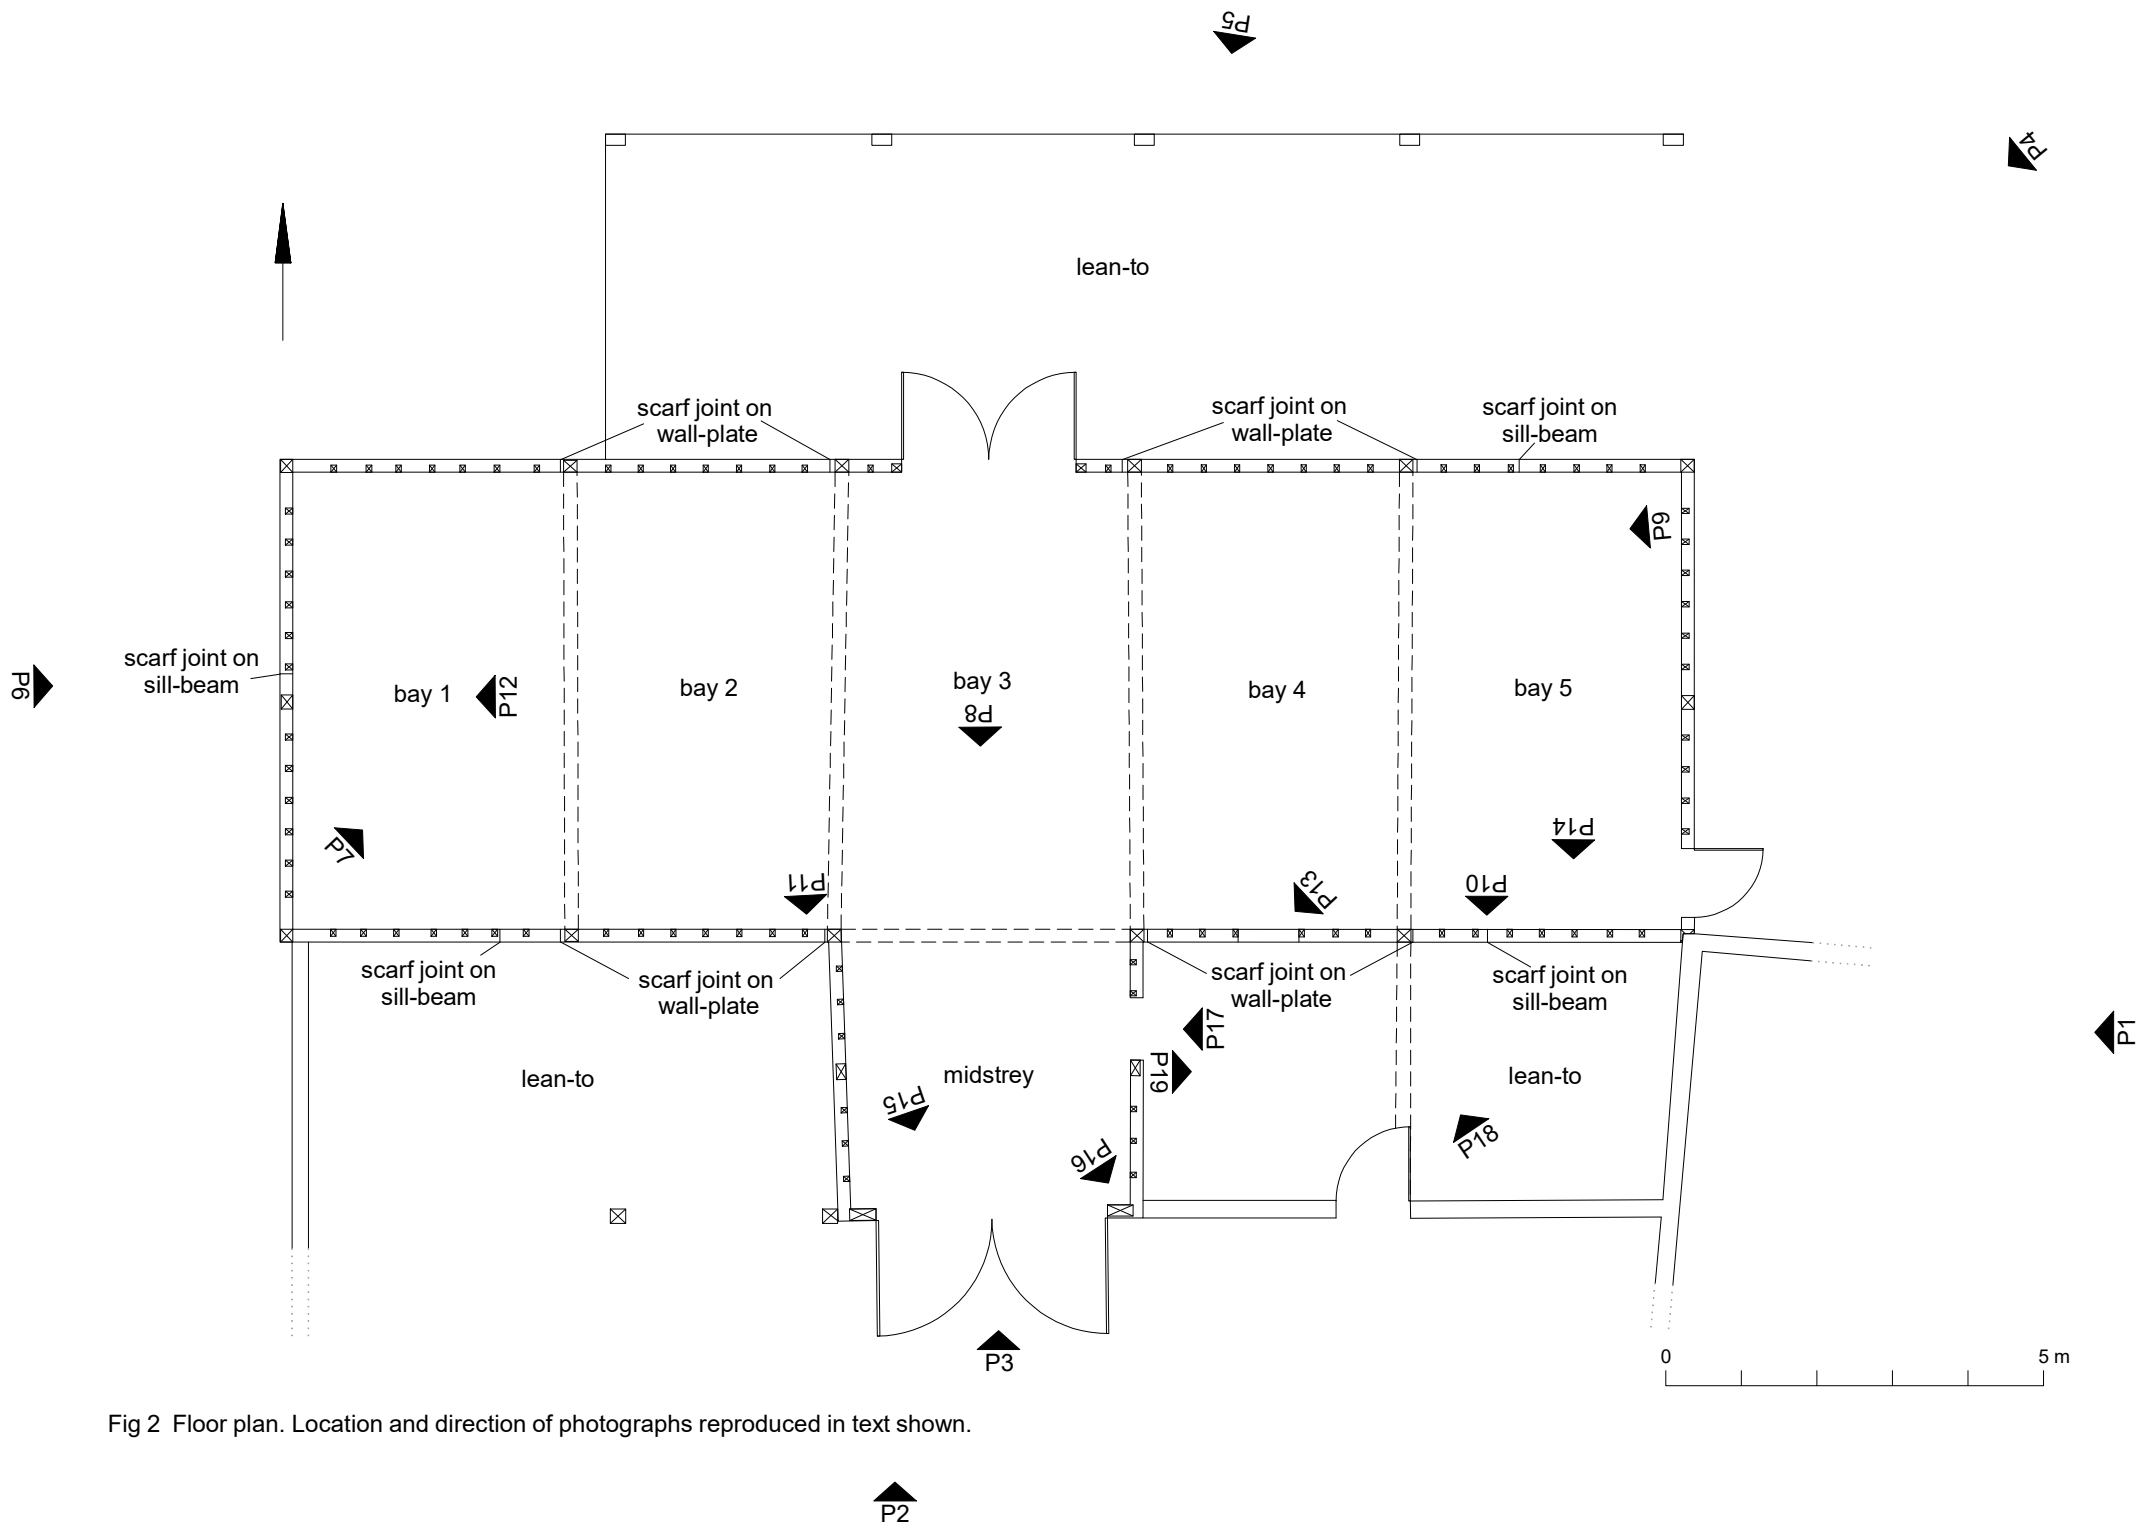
Floor plan. Location and direction of photographs reproduced in text shown.
